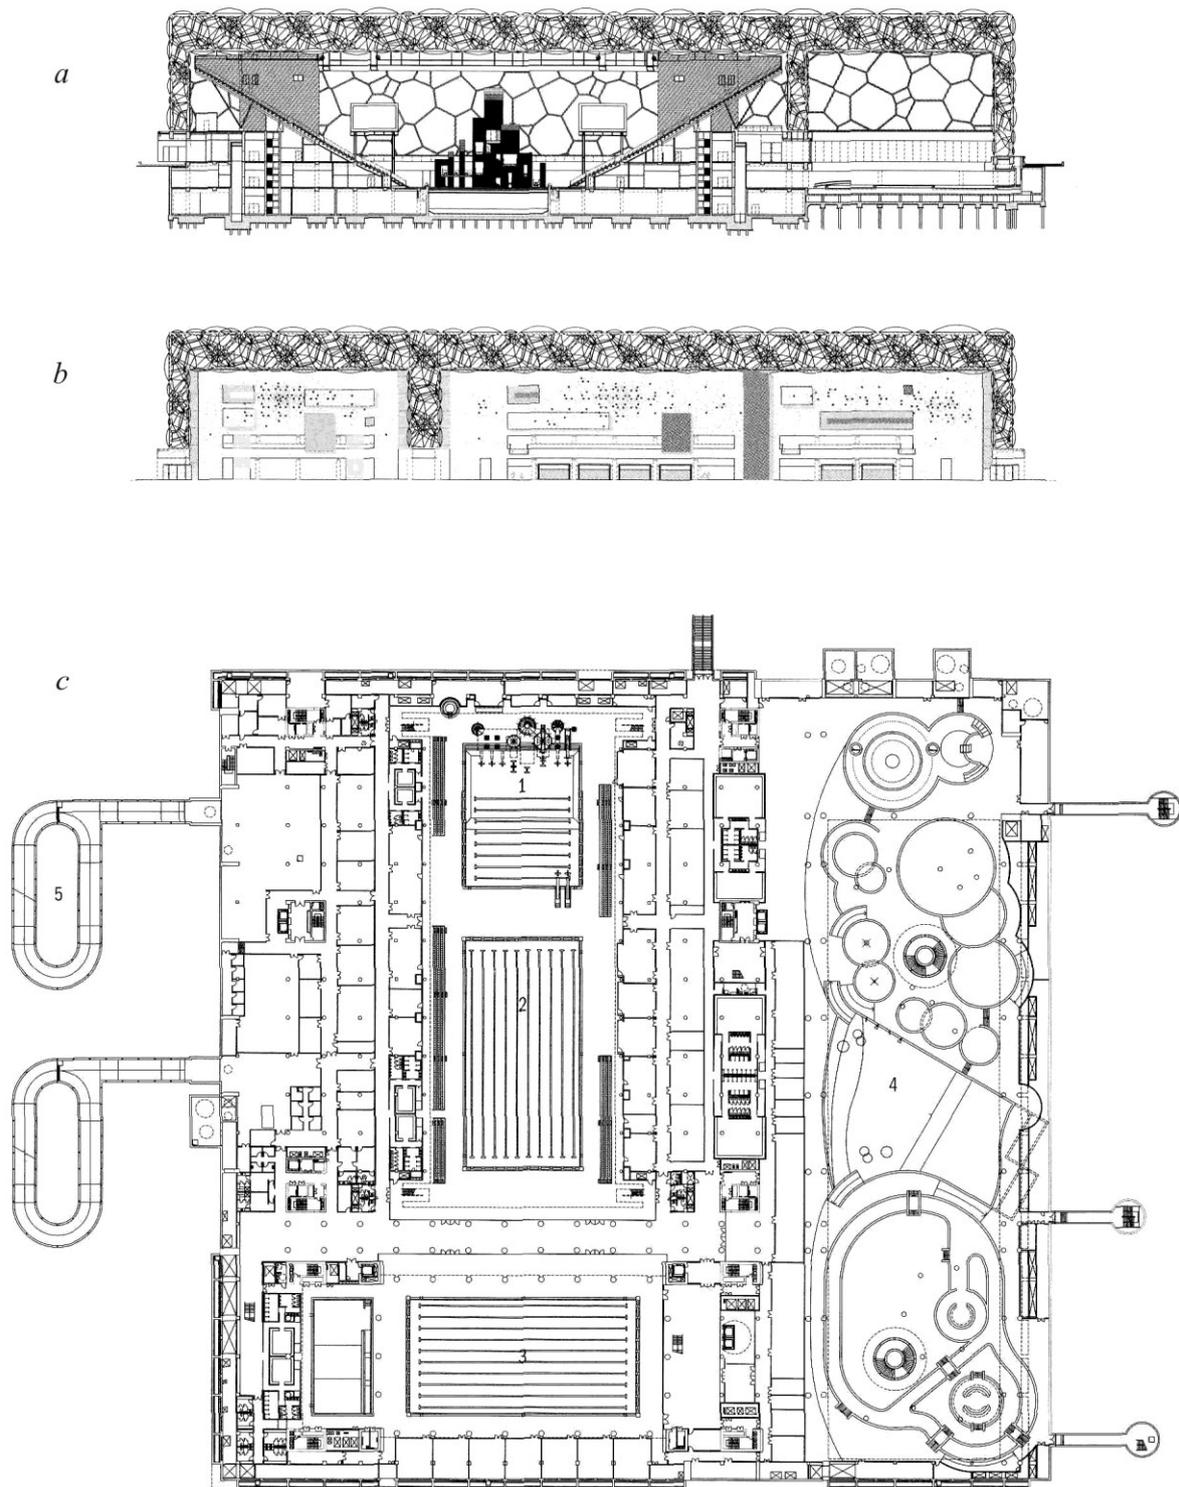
National Water Sports Center (Water Cube), Beijing, China. Designed by: PTW Architects (Australia), Consultants: PTW Architects, CCDI, Arup: a – cross section; b – longitudinal section (in the baths of the main pools); c – ground floor plan: 1 – 25 m high jump tower; 2 – 50-metre swimming pool; 3 – training 50-metre pool; 4 – water and entertainment complex; 5 – entrance ramps for persons with disability
